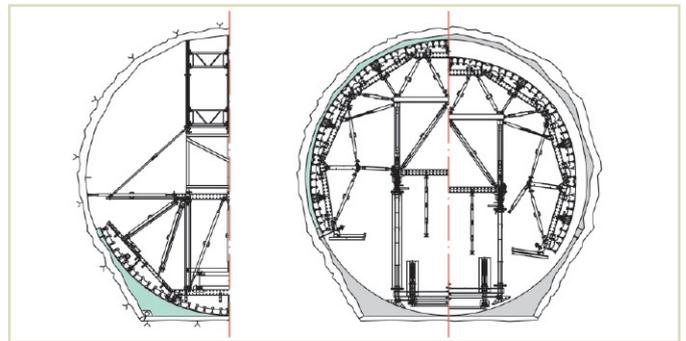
Pre-lining: The bottom slab and arched formwork in use as reinforcement and support protection for concreting the outer diameter of 10.08 m. // Bild 7. Pre-Lining: Die Sohl- und Gewölbeschulung im Einsatz als Ausbruchssicherung zum Betonieren des äußeren Durchmessers von 10,08 m. Source/Quelle: PERI
